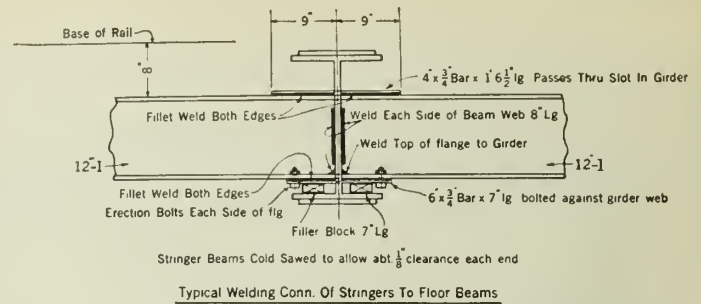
Plan of Typical Stringer-to-Floor-Beam Connection for Chicopee Falls Bridge.
